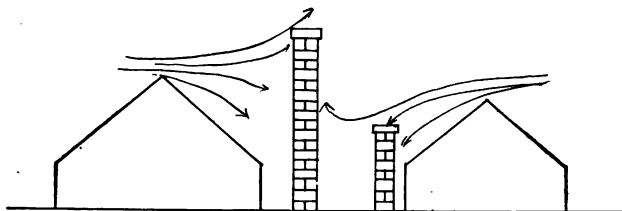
Chimneys should extend above the roofs of adjacent buildings
